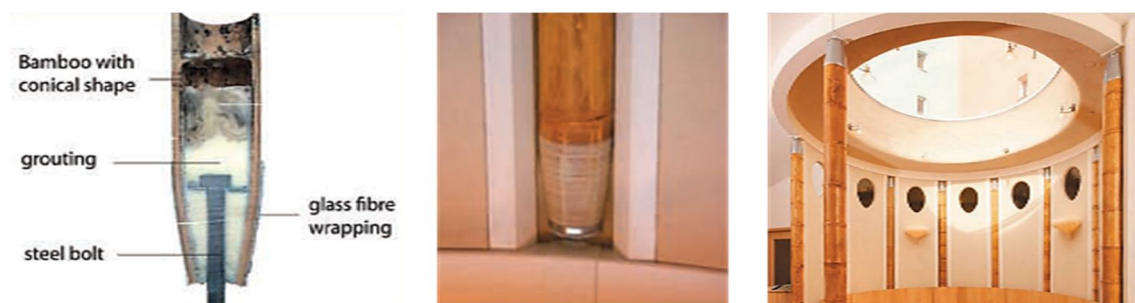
Improved connections with glass fibre wrapping and combination of building systems at the bamboo straw-bale house by Susanne Korner & Tilman Schaeberle, Germany (Henrikson & Greenberg, 2011).
